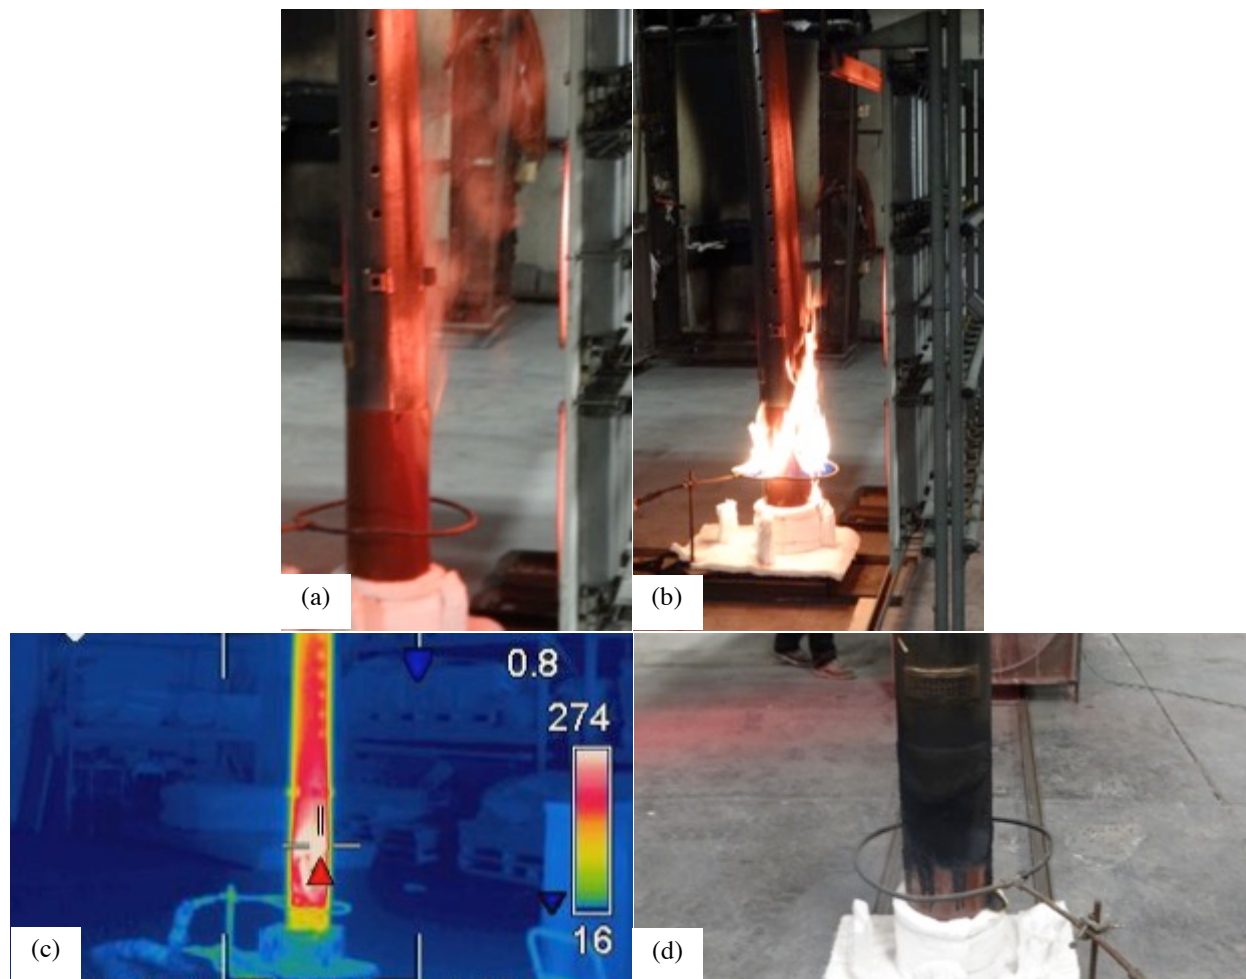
Test 1 showing (a) smoking, (b) ring burner, (c) IR in wind, and (d) after test.
